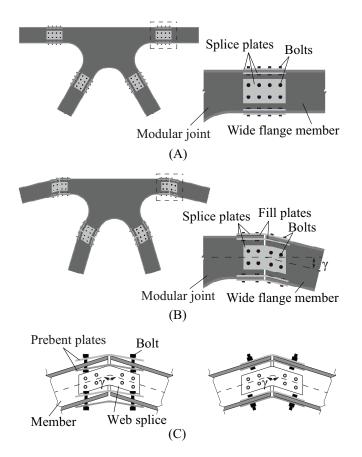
Connection between modular joints and members: (A) Via straight splice plates, (B) Via adjustable bolted steel plate connection, and (C) Field installation of the adjustable steel plate connection by bolt tightening: untightened (left) and final tightened (right) state [(C) adapted from Gerbo et al. (2019, 2020a), ©ASCE].
